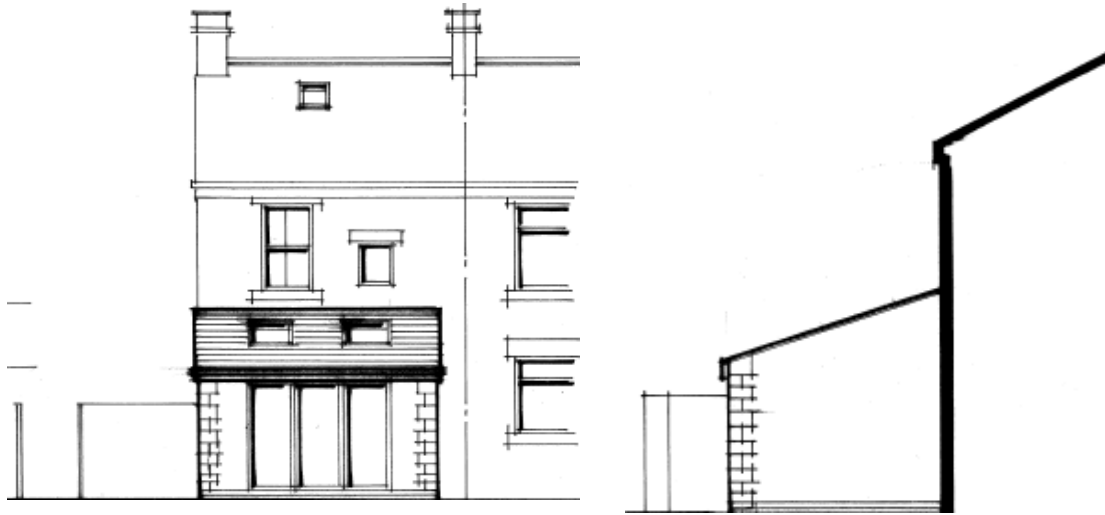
Proposed Side Elevation facing No.16 Tower Street (bottom right)
